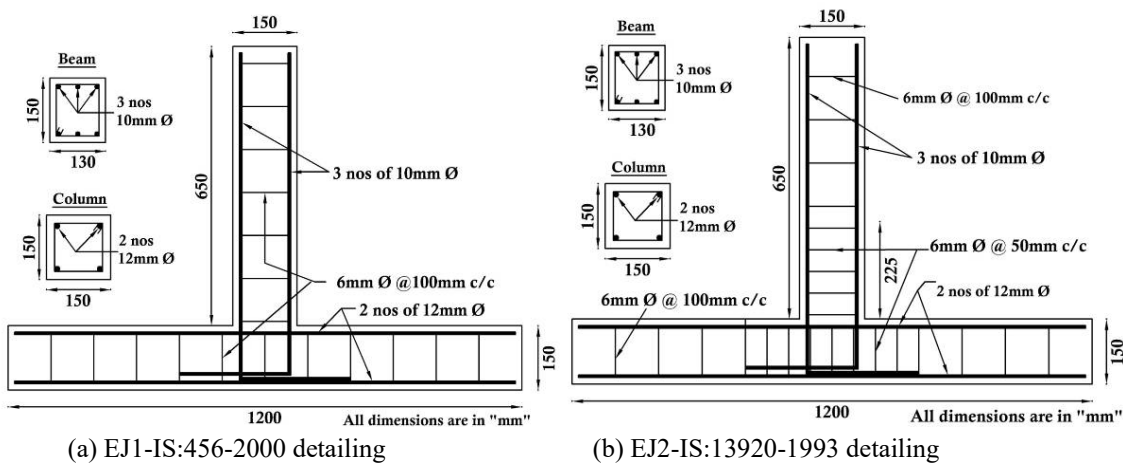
Reinforcement details of exterior beam-column joint specimens (a) EJ 1 (b) EJ 2.
